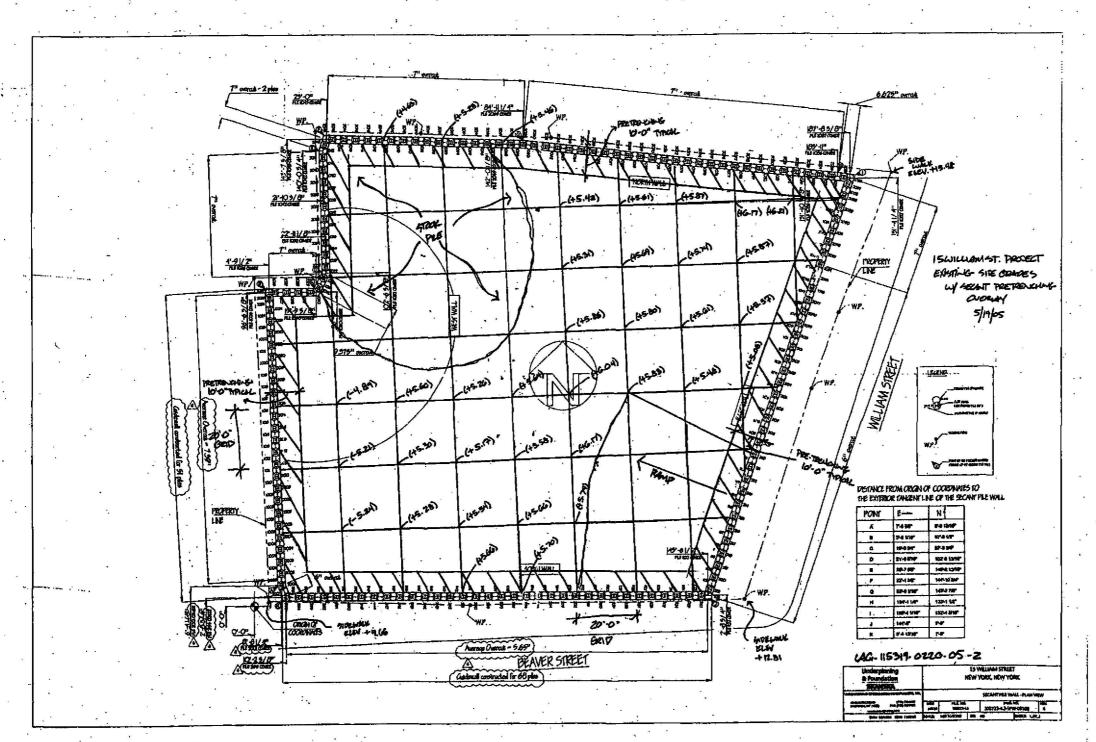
Location of Perimeter Excavation Trench for secant pilings. Elevations of depth of pre-excavation work (Elevations in relation to Manhattan datum). (SLCE Architects, 4/14/05)
